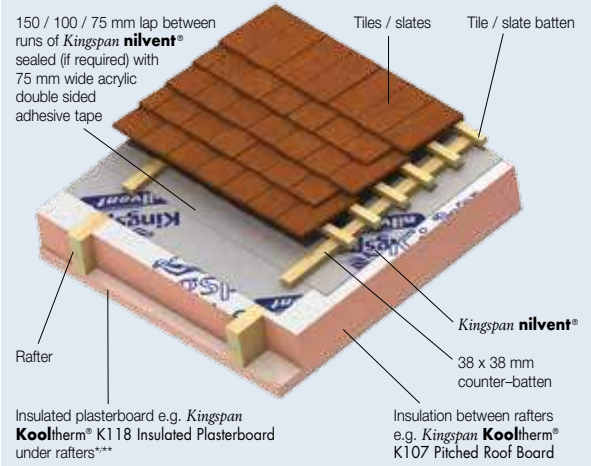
Fully Filled Insulation Between Rafters – No Sarking Board – Battens & Tiles
